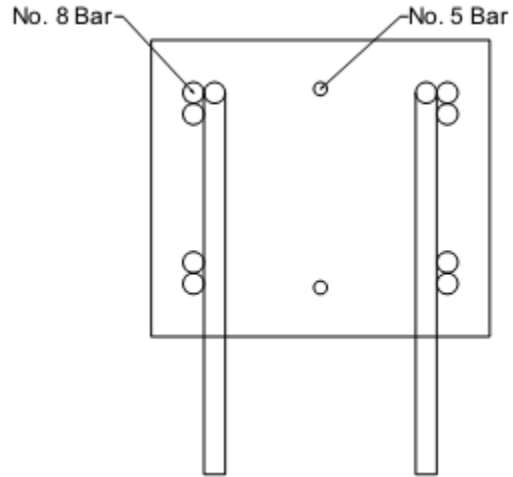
Longitudinal column reinforcement-8 No. 8 bars + 2 No. 5 bars. Transverse reinforcement not shown.
